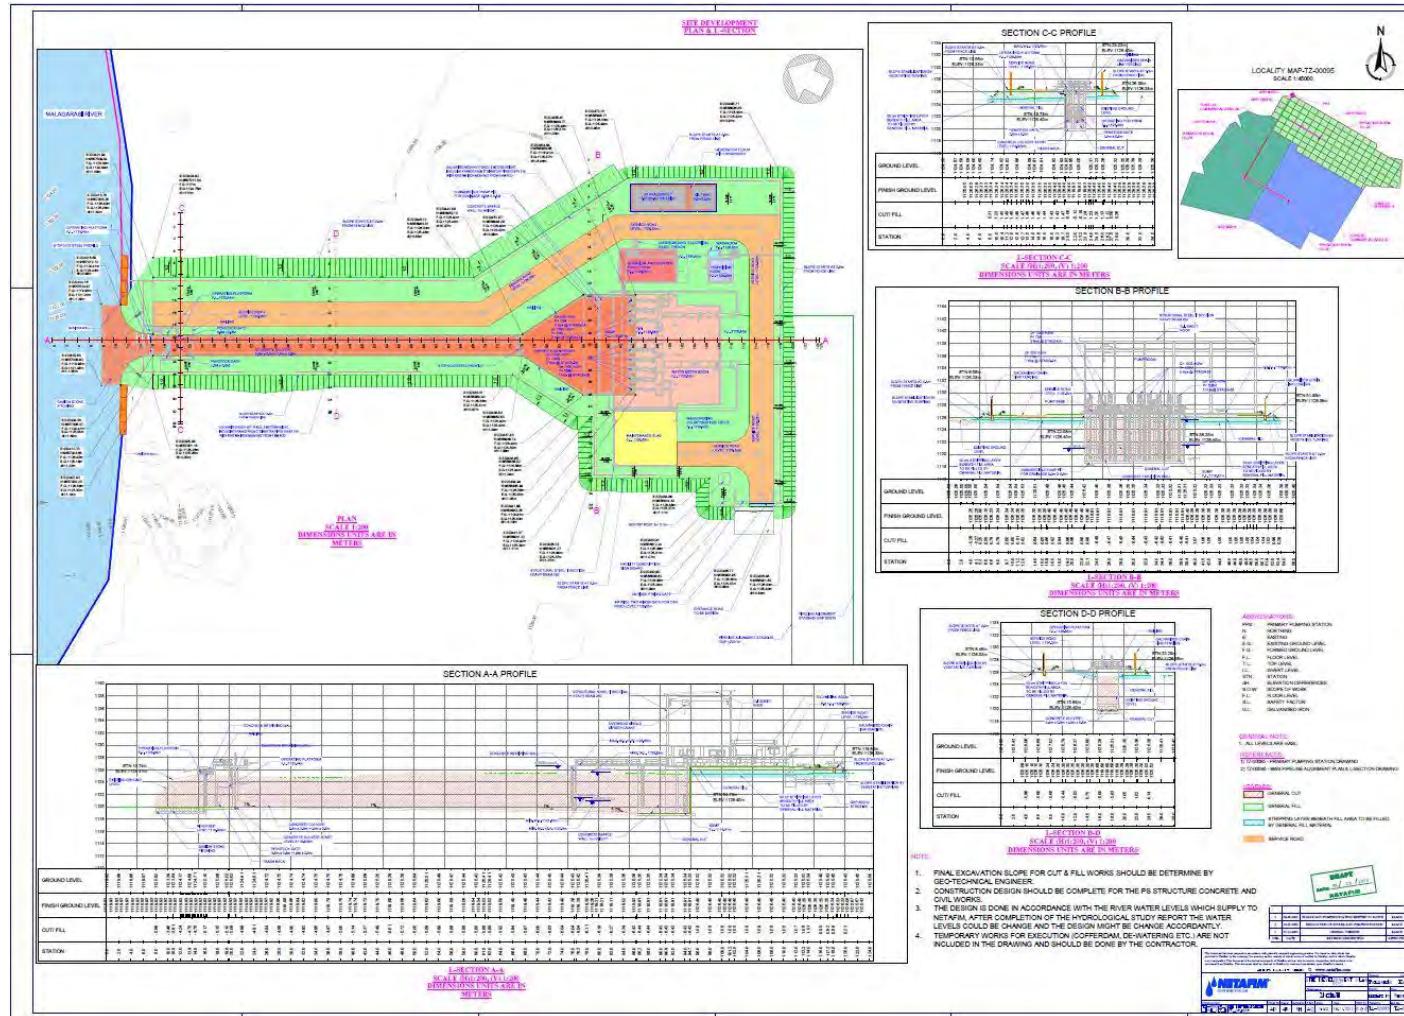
INTAKE 2 SITE DEVELOPMENT PLAN
